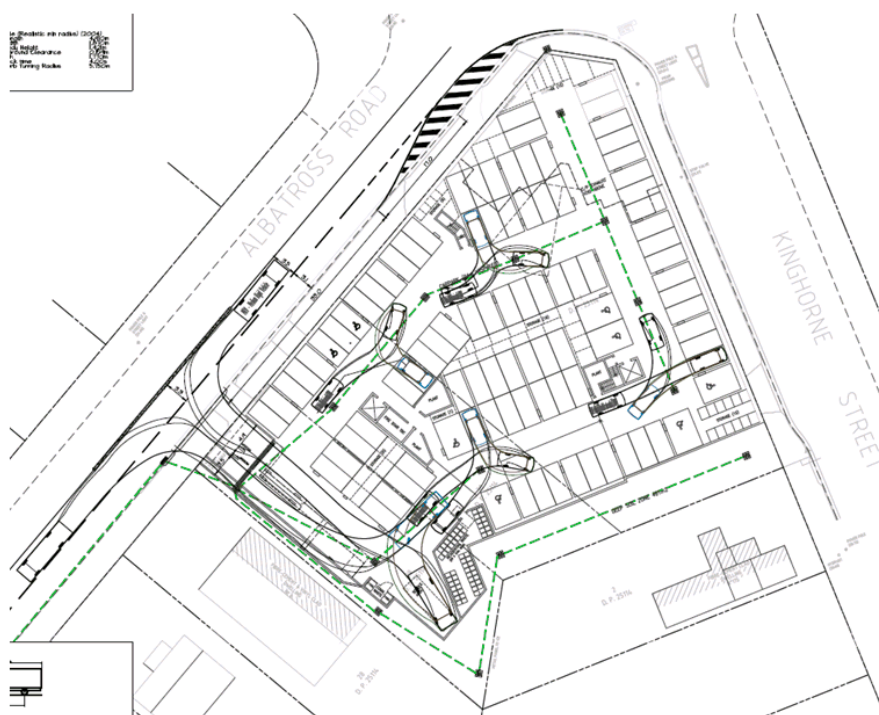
Extract of engineering design plan indicating the slip-lane and entry design to the development. The design includes a central median on Albatross road to limit vehicle movements to a left in and left out movement.
